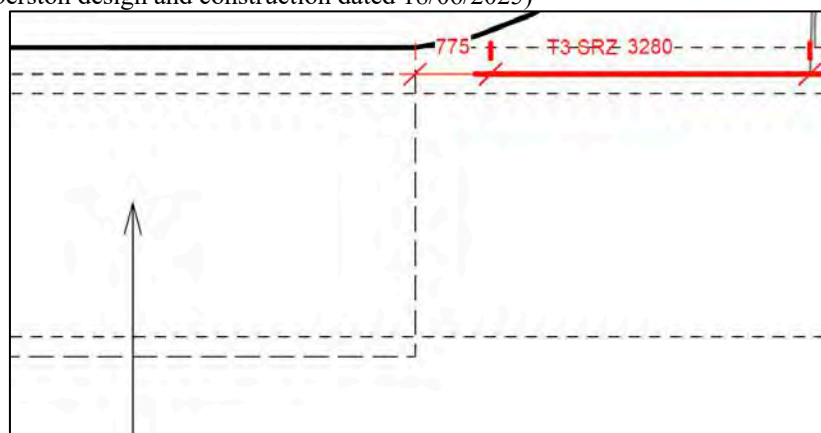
The SRZ for Tree 3 is not impact by the proposed excavation or construction works.. (Source: Site Plans by askerroberston design and construction dated 18/06/2025)
